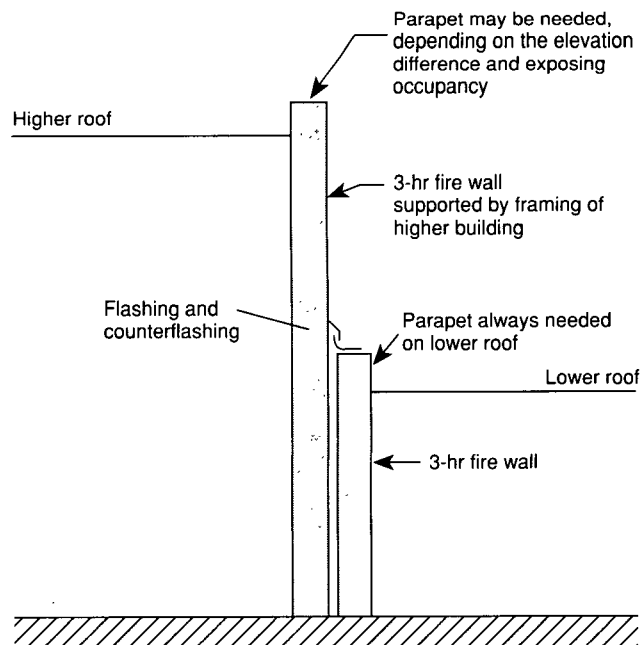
(a) Fire wall arrangement at elevation difference (double wall).
